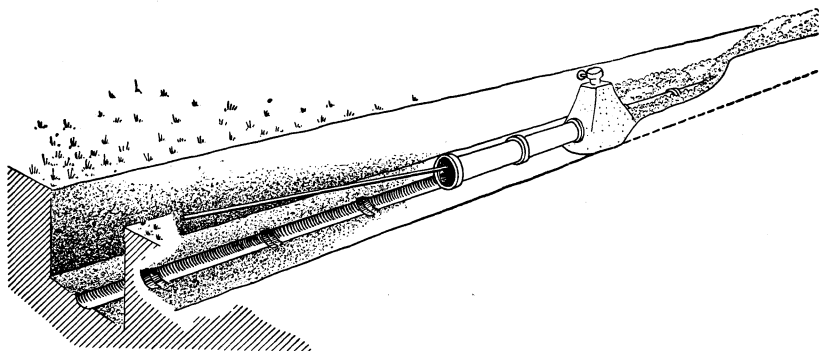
Installing a vitrified sewer-pipe distribution system.
